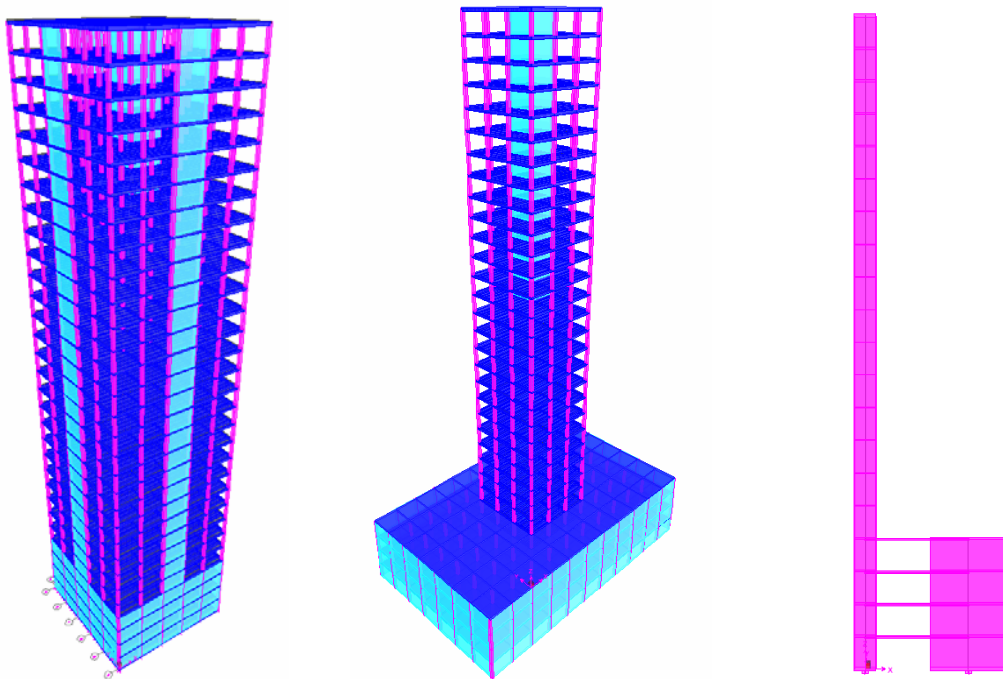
Model of two typical high-rise buildings walls and the corresponding simplified 2-D model.
